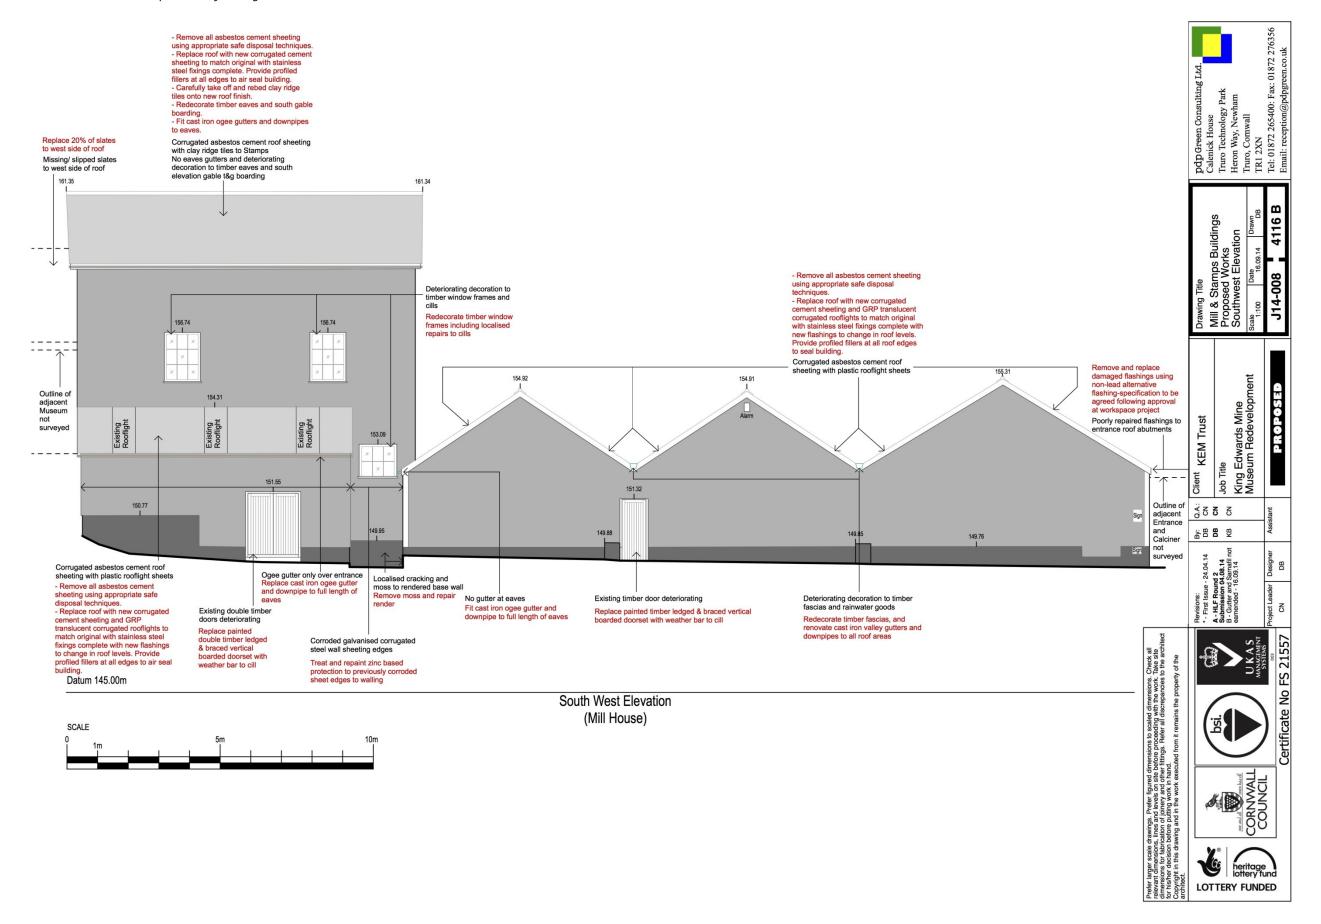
South west elevation of the Mill and Stamps proposed works (PdP Green Cons. Ltd Dwg No. 4116B)
